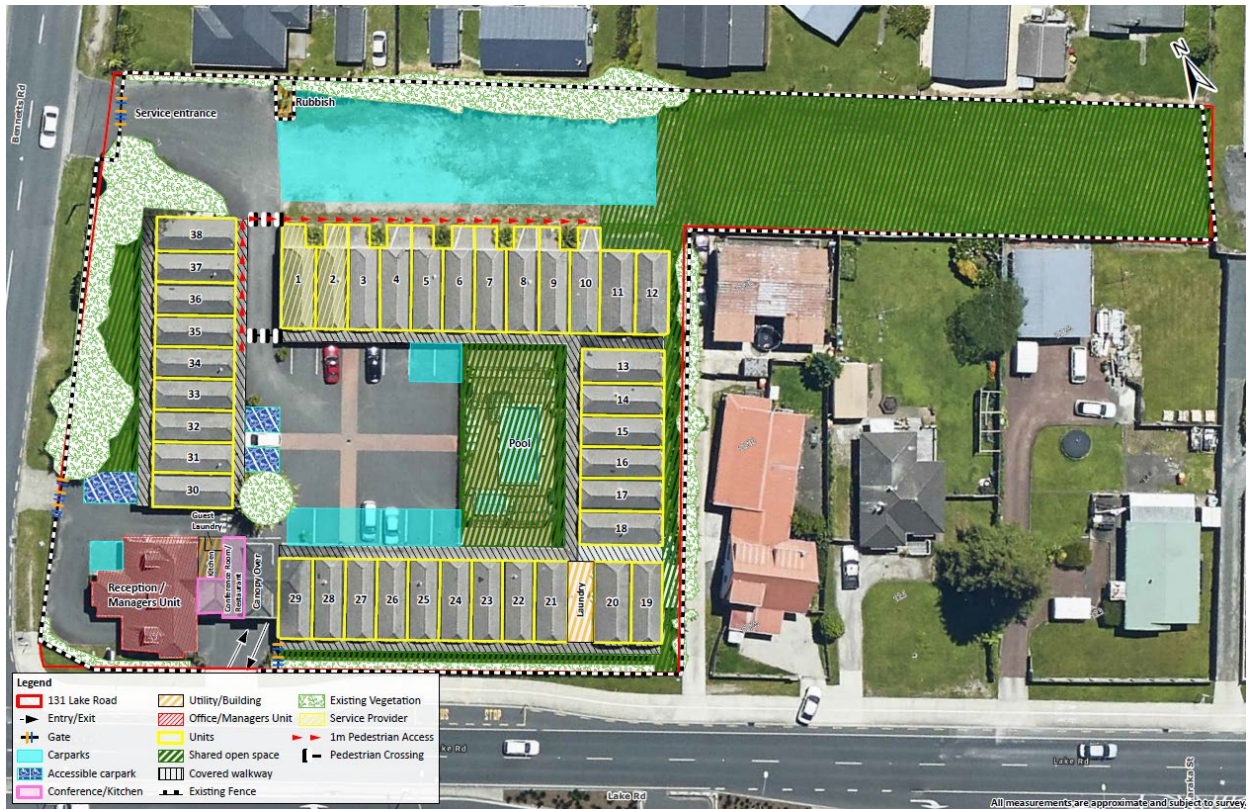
Site plan showing number of units, carparking, managers unit/office and children’s play area.
